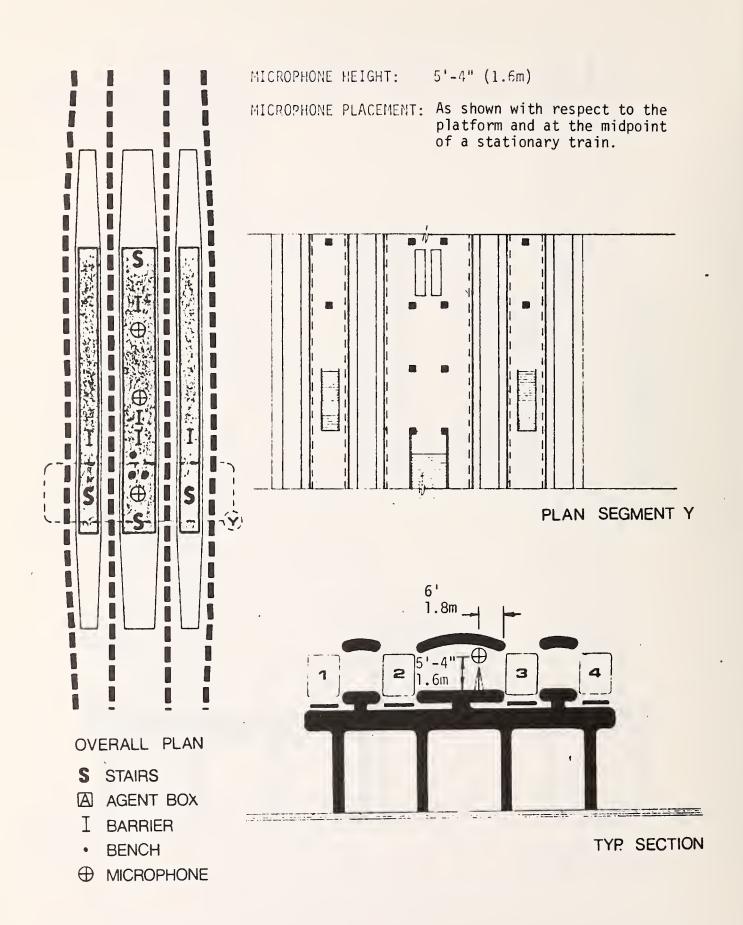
Dual Center Platform Elevated Steel Station Configuration (Station Type 3)
